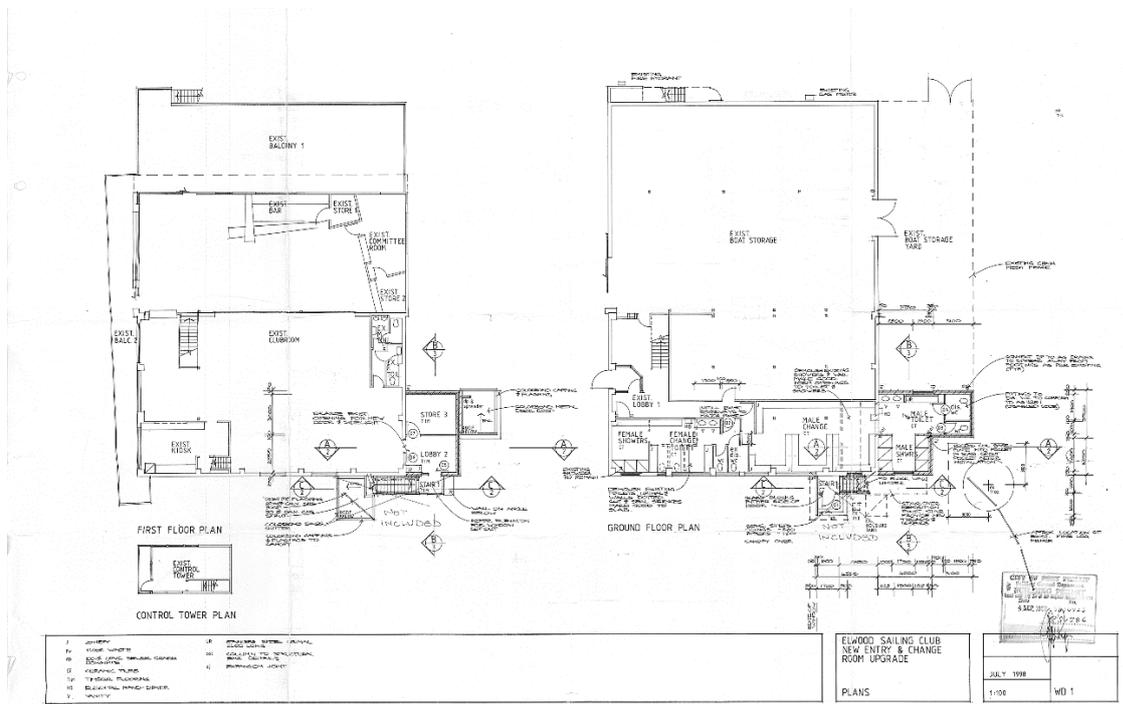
Floor plans for the new entry and change room upgrade, dated 1998 (Source: City of St Kilda)
